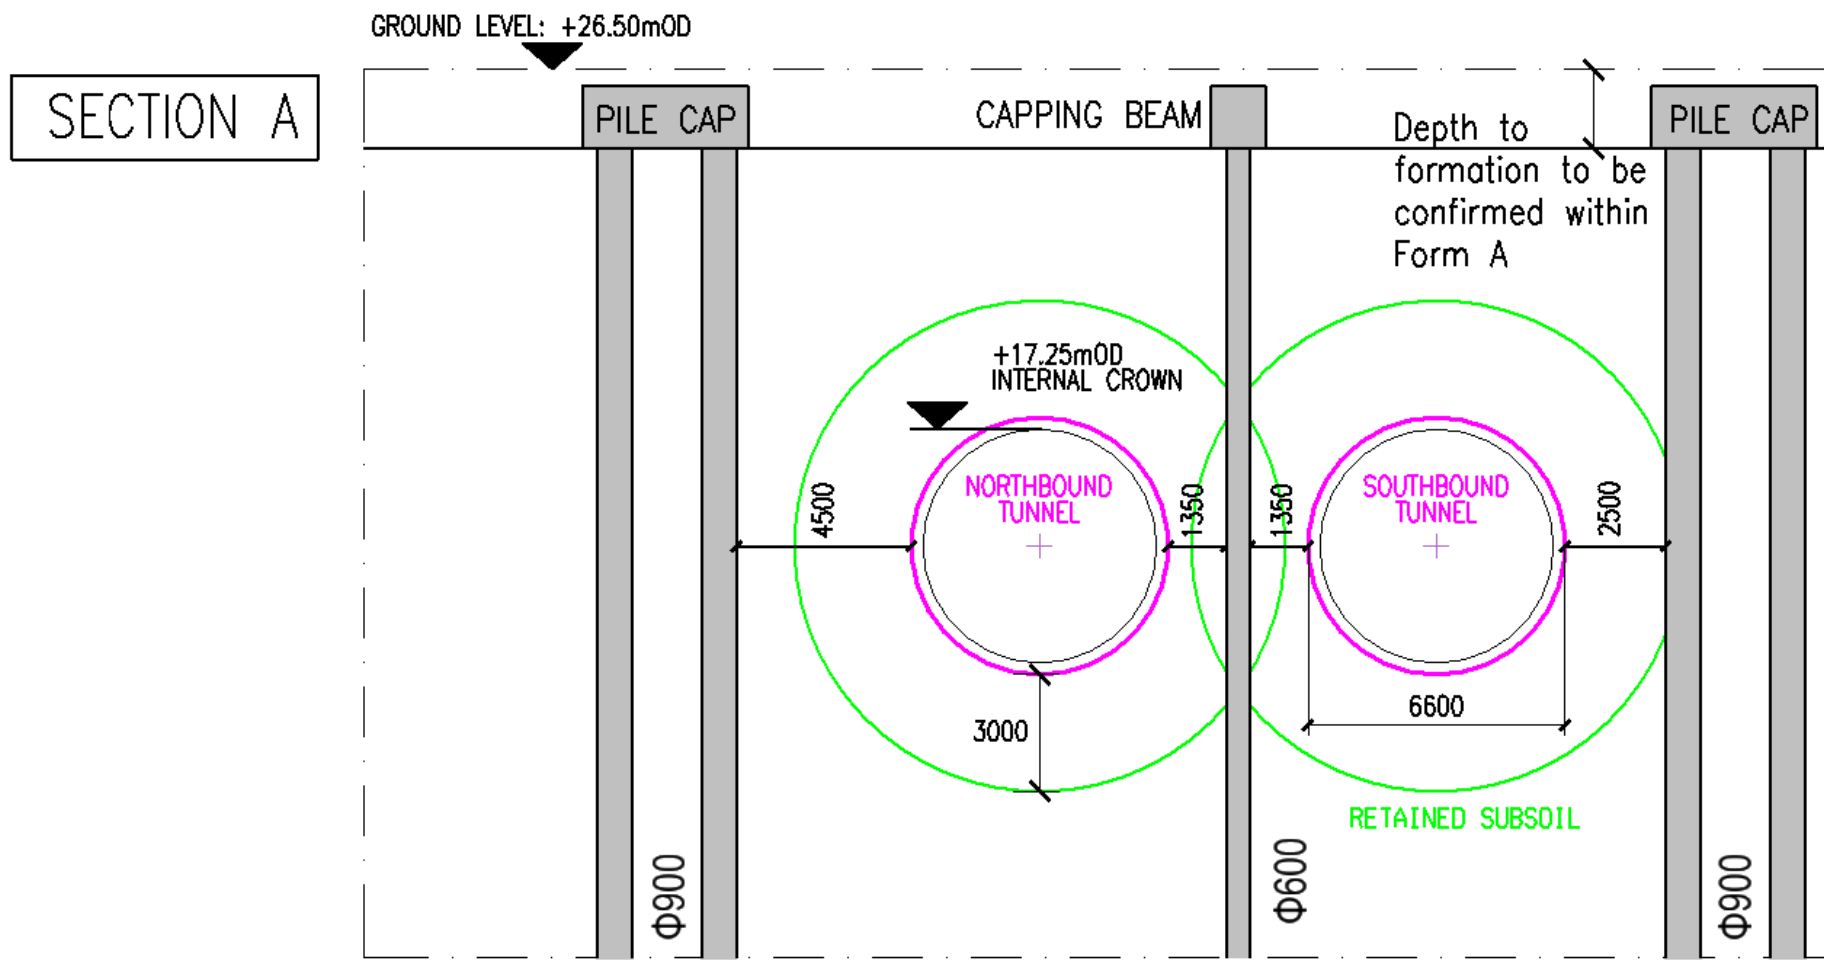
Pile Arrangement Adjacent to Tunnels
